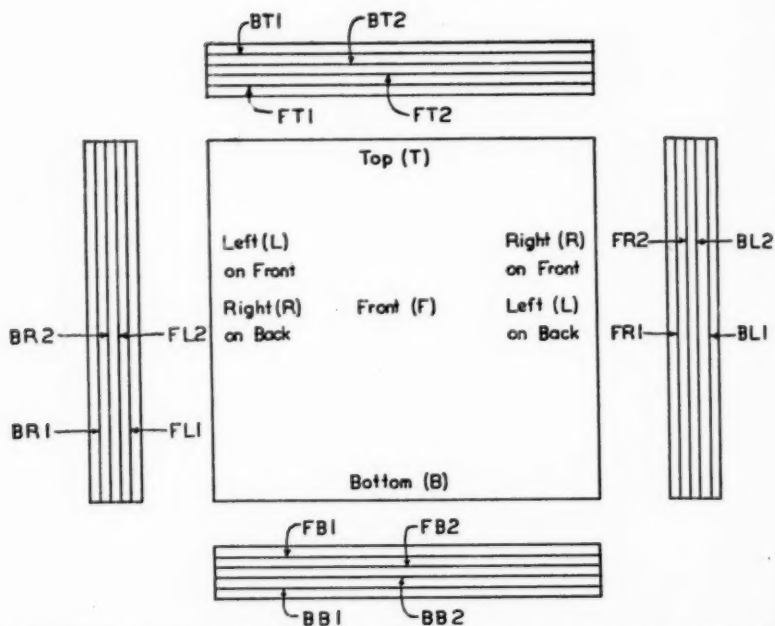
Schematic Drawing of Method of Testing Plywood with Apparatus Shown in Fig. 30.
